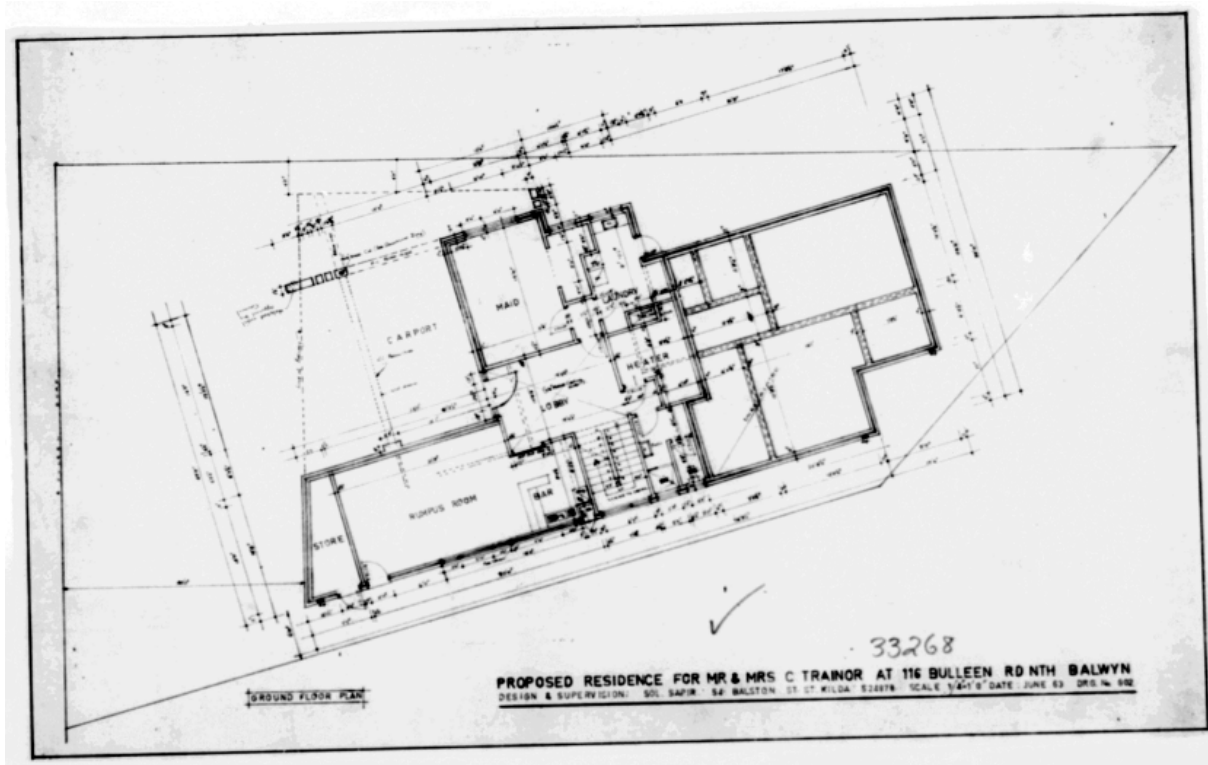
Ground floor plan for 116 Bulleen Road, North Balwyn. (Source: BP 33268)
